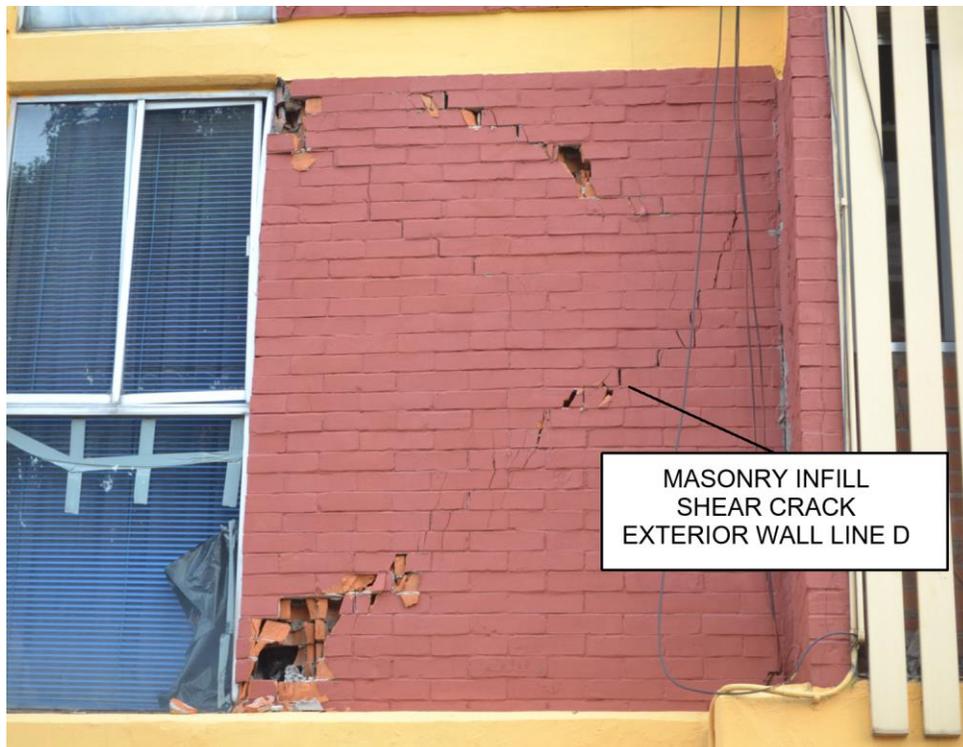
Shear Cracks through Masonry Infill Walls Exterior View
